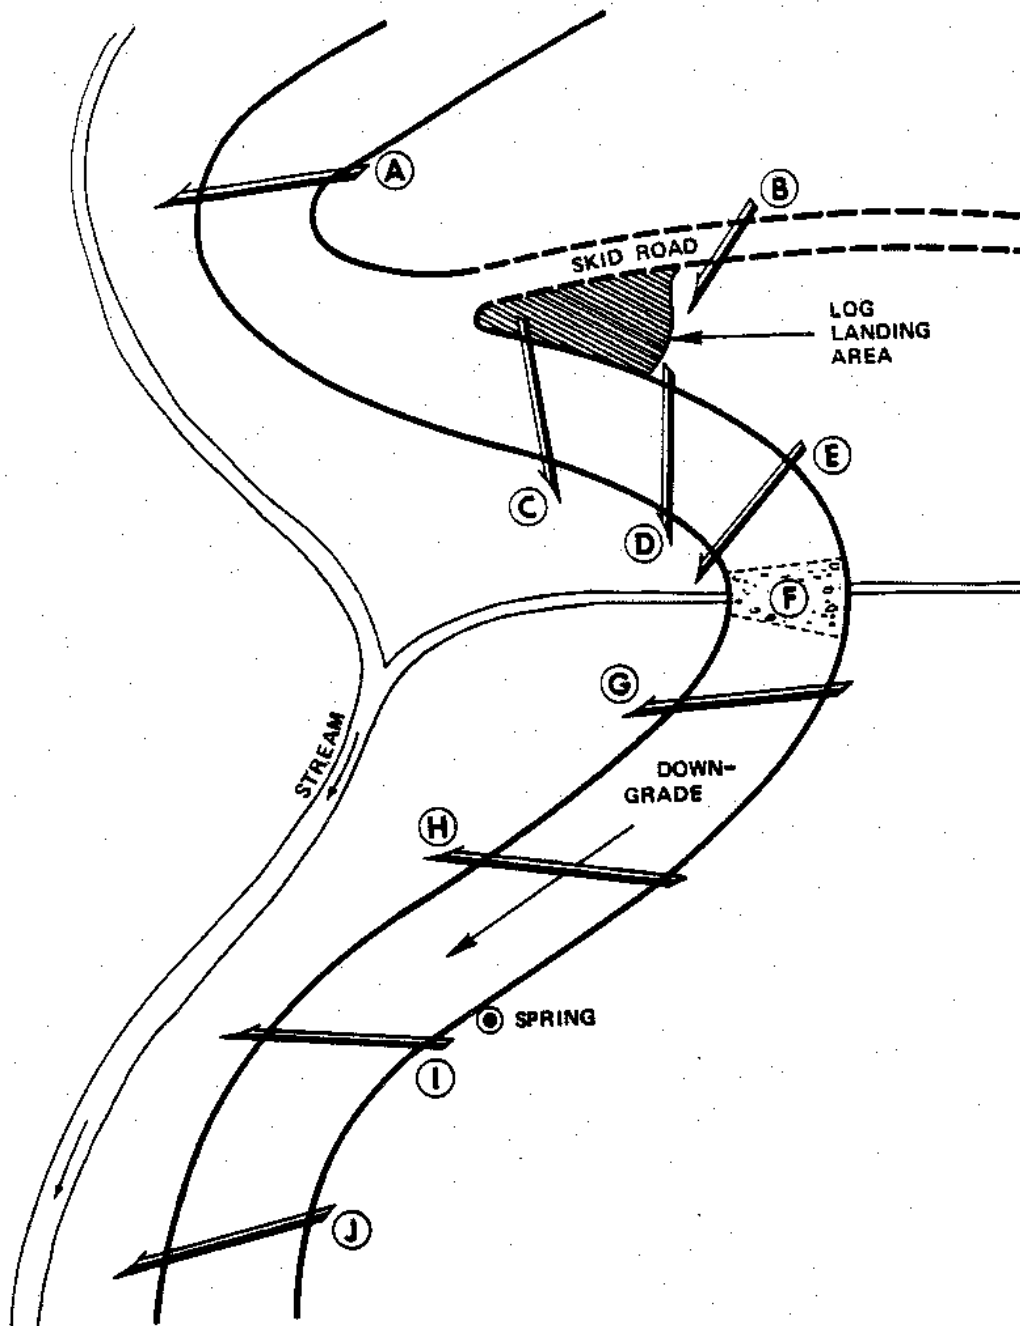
Guide for locating cross drains. Several locations require cross drains independent of spacing guides. A and J, divert water from ridge; A, B, and C, cross drain above and below junction; C and D, locate drains below log landing areas; D and H, drains located with regular spacing; E, drain above incurve to prevent bank cutting and keep road surface water from entering draw; E, ford or culvert in draw; G, drain below inside curve to prevent water from running down road; I, drain below seeps and springs. (Megahan, 1977)
